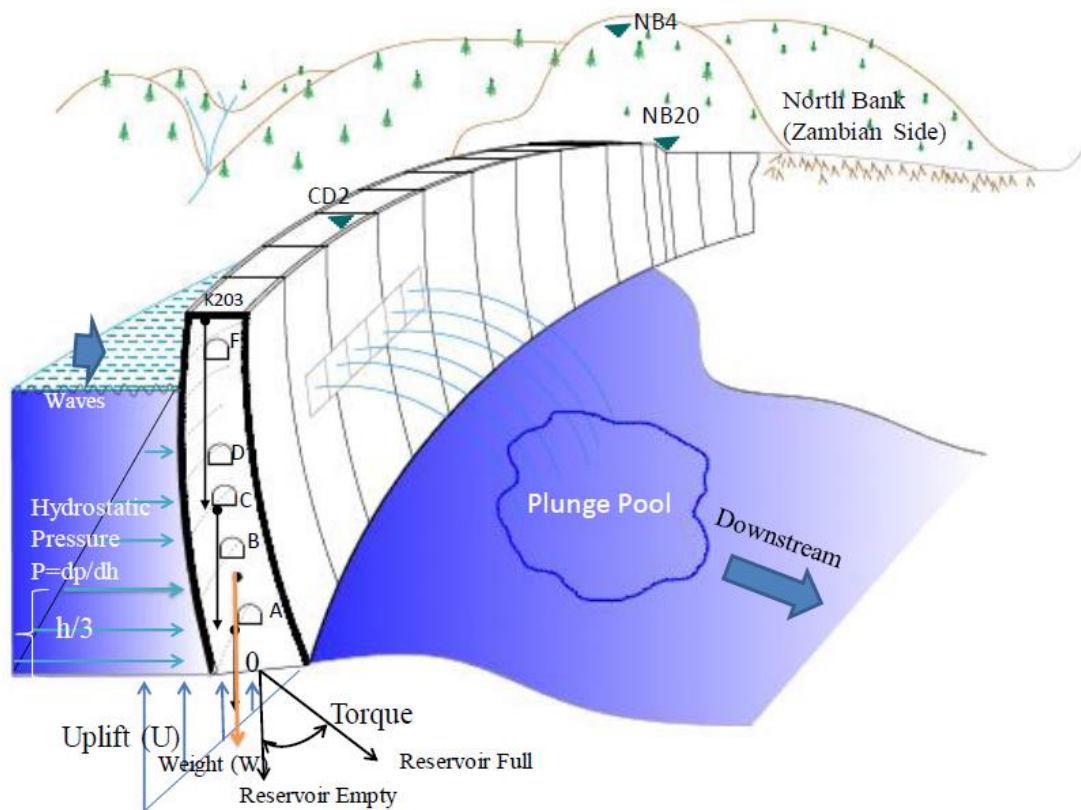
Cross section of Kariba Dam, viewed from Zimbabwean side (South Bank)-not to scale
